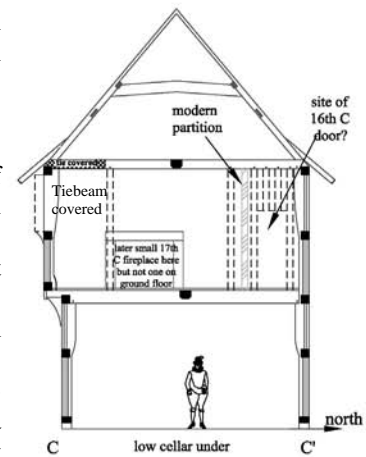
Cross-section of truss CC' of timber framed range (not to scale)
